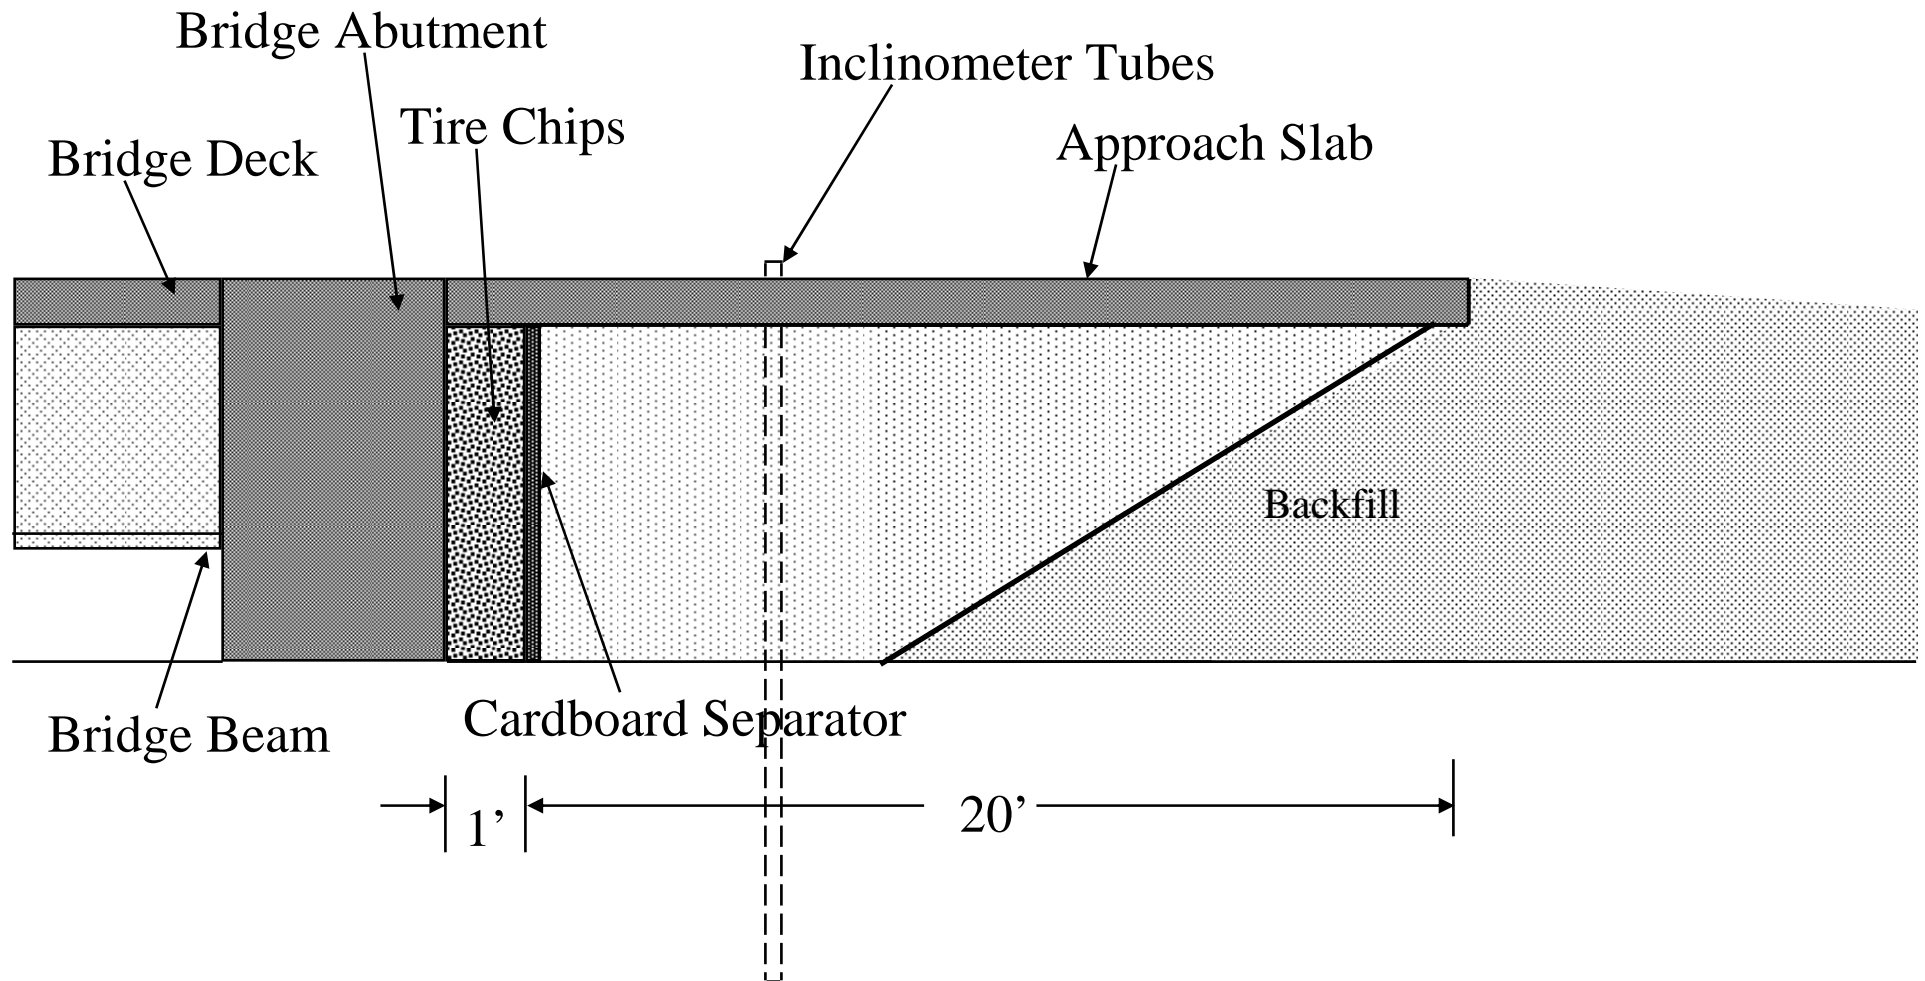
Constructed model bridge backfill system using a 12 inch layer of rubber tire chips
